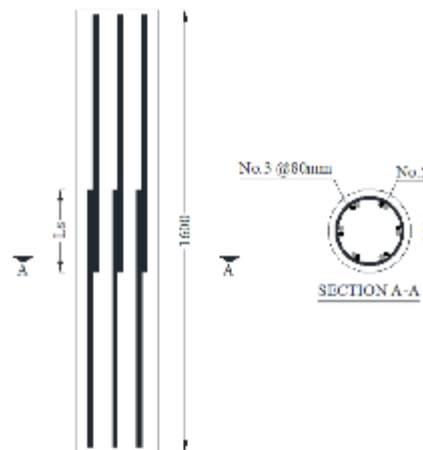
Geometric and reinforcement details of the test specimens (all dimensions are in mm).
